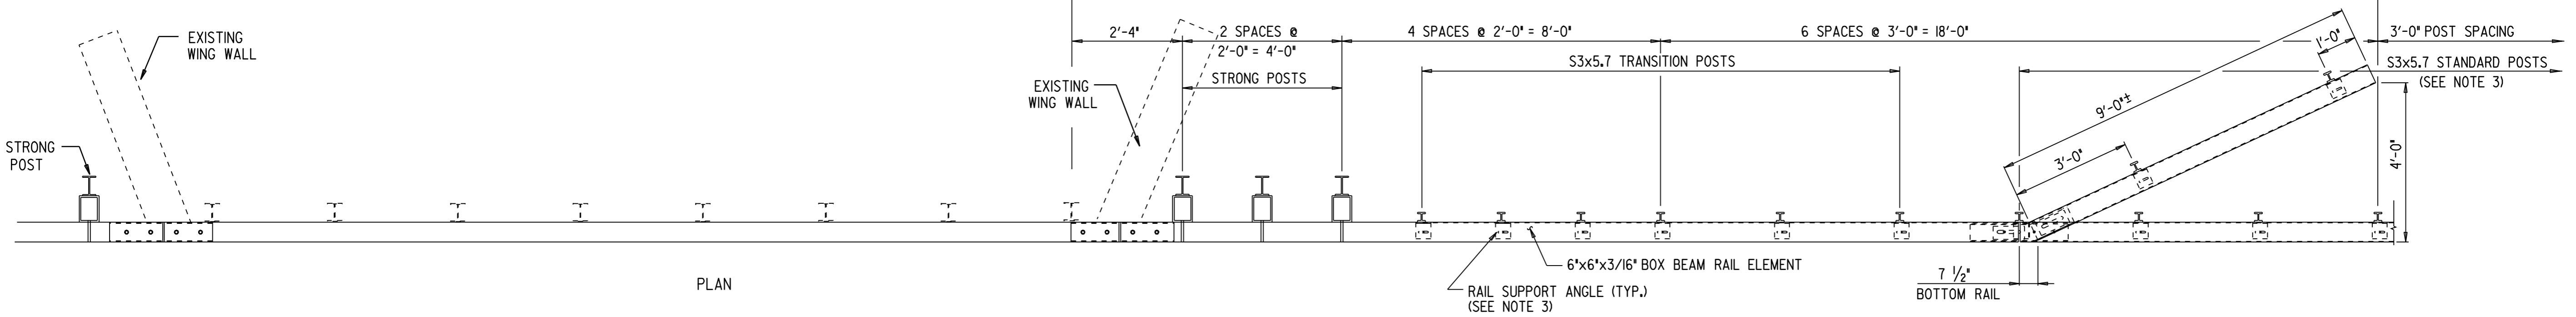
DETAIL FOR ATTACHING BOX BEAM GUARD RAIL TO EXISTING CONCRETE POSTS BRIDGE 148
